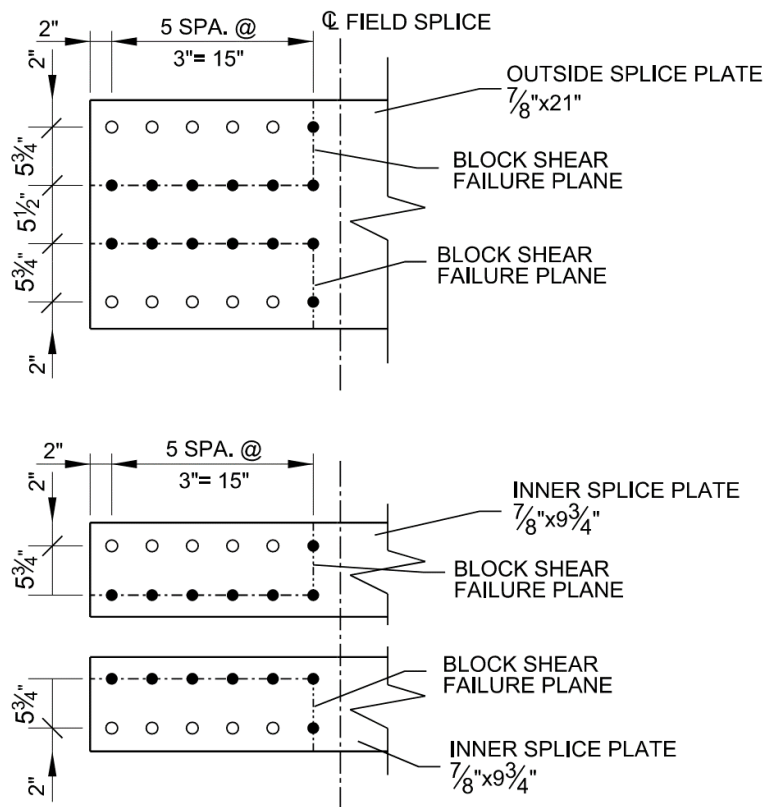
Bottom Flange Splice – Assumed Block Shear Failure Planes in the Splice Plates
